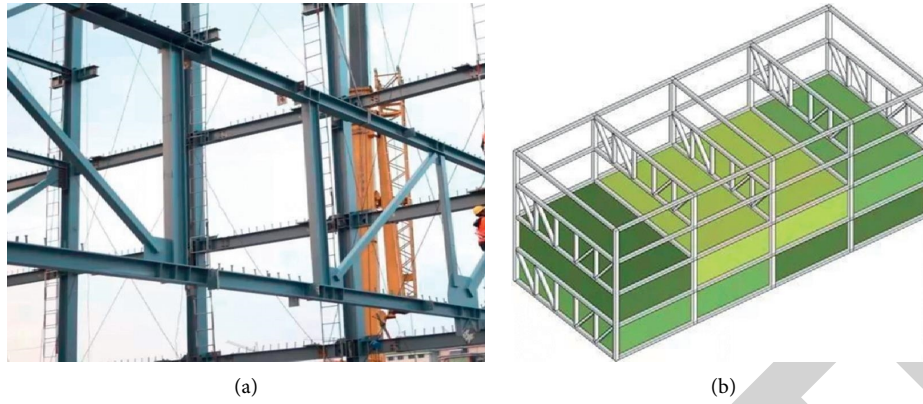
Staggered truss steel structure. (a) The staggered truss steel structure in reality; (b) a 3D model of the staggered truss steel structure.
